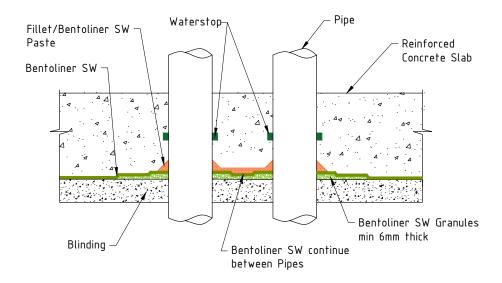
Multiple pipe penetrations. Trowel Sealant around pipes and covering area between the pipes
